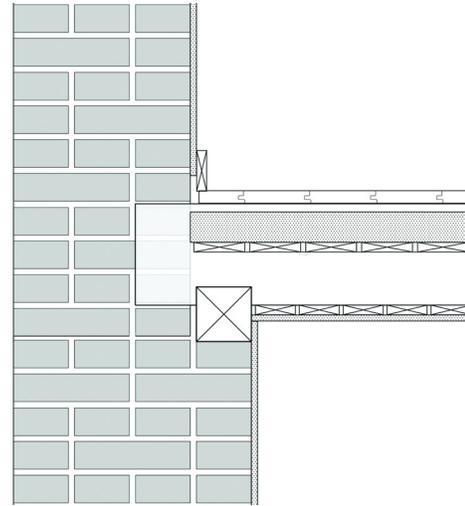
Vertical section of the joint between the exterior load-bearing wall, which is the facade, and the horizontal division. The exterior wall is a solid brick wall that decreases in thickness by half a brick every two stories. The timber beams reach into the brick wall.
